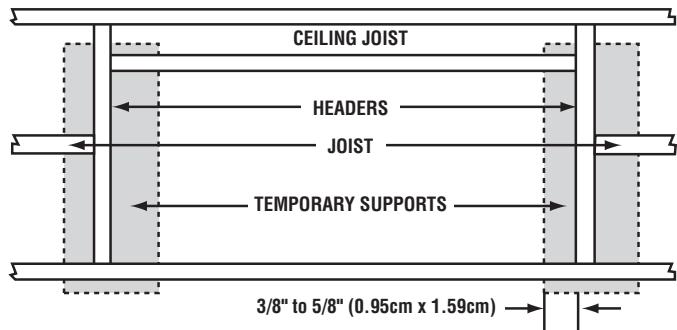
FRAMED OPENING WITH TEMPORARY SUPPORT SLATS READY TO RECEIVE STAIRS
